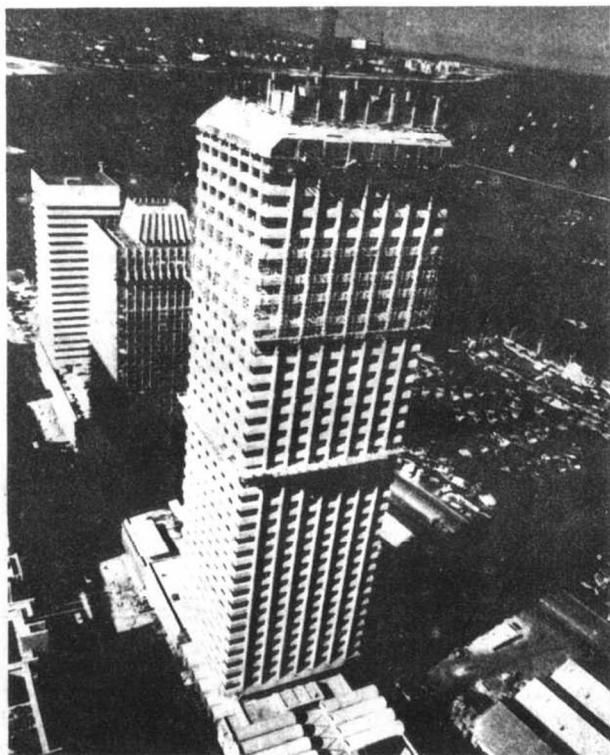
Forty-story office building in Singapore has 8 in. posttensioned flat slabs with 30-ft spans. Reduced floor depth made possible a 40-ft reduction in the height of the building (T. Y. Lin International, Consulting Engineers).
